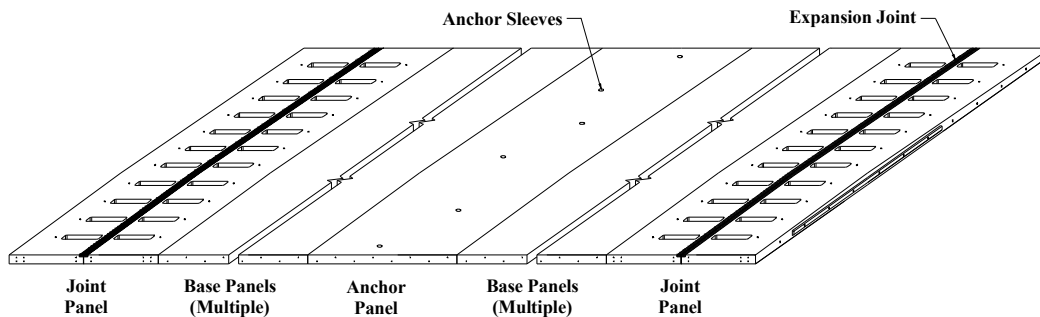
Typical Precast Prestressed Concrete Pavement Panel Layout.
